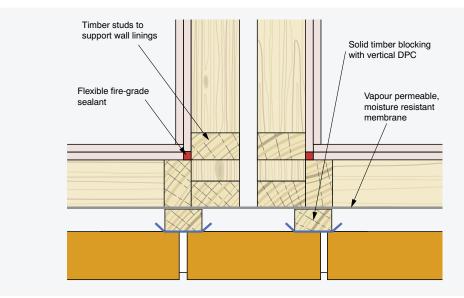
Double stud fire-protected timber internal wall intersecting a brick veneer wall with split cavity barrier system.
